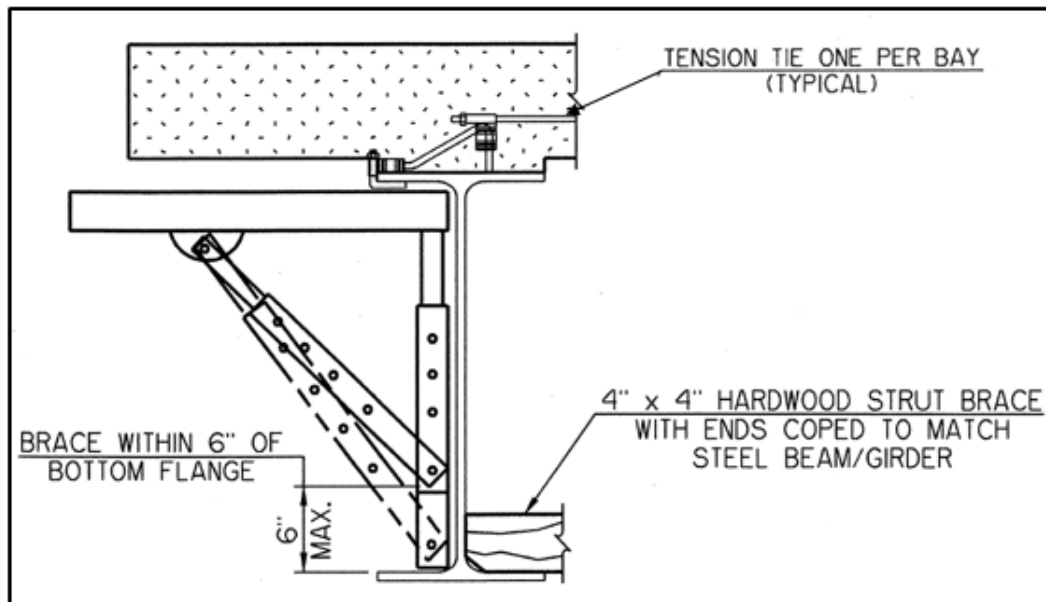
ODOT standard detail drawing for Bridge Deck Overhang Formwork Bracing (Dayton Superior Bridge Deck Handbook 2017)
